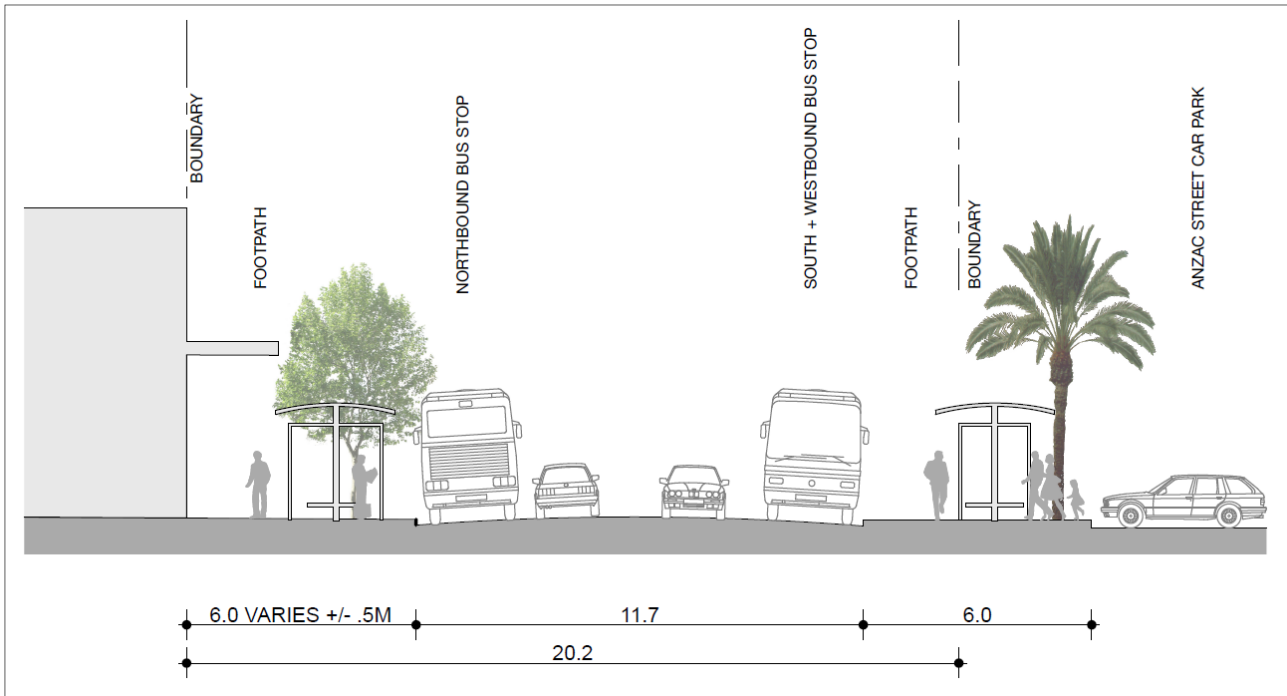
Proposed Cross Section for Lake Road with Bus Station retained (Indicative) – Looking North)
